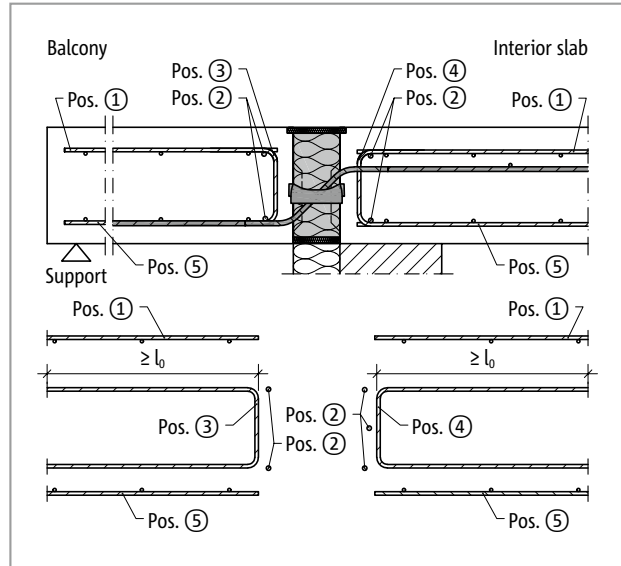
Schöck Isokorb® T Type CQ-V6 up to CQ-V10: On-site reinforcement
